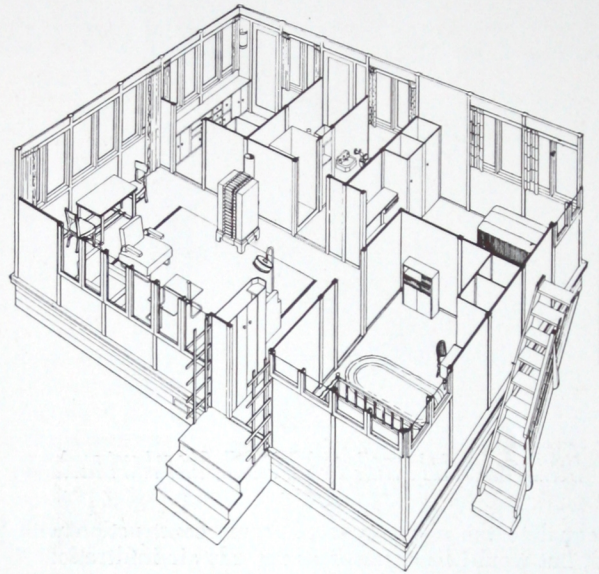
Perspective drawing of completed house with roof removed, showing floor arrangement and built-in features.
